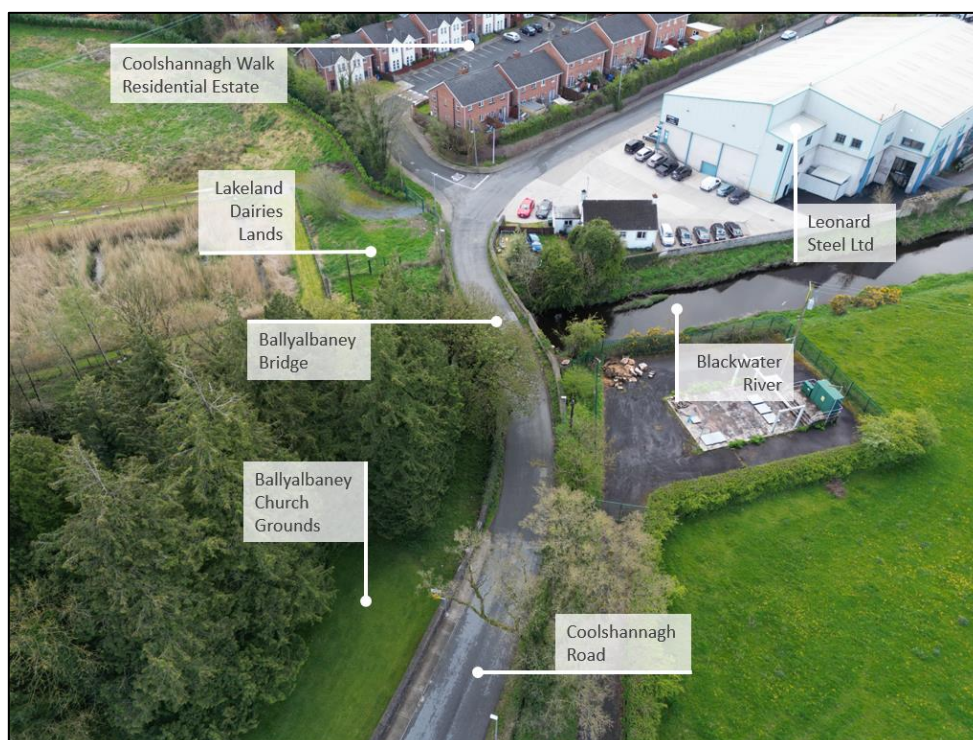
Aerial View of Ballyalbaney Bridge
